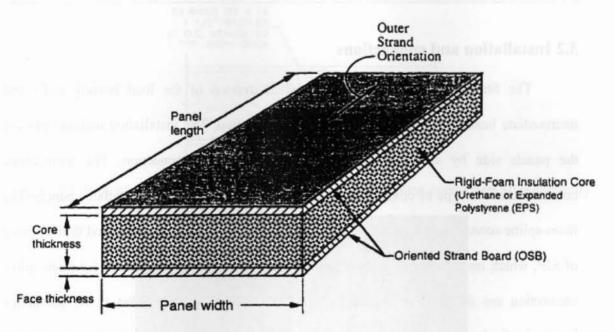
Sketch of Structural Insulated Panel, SIP
